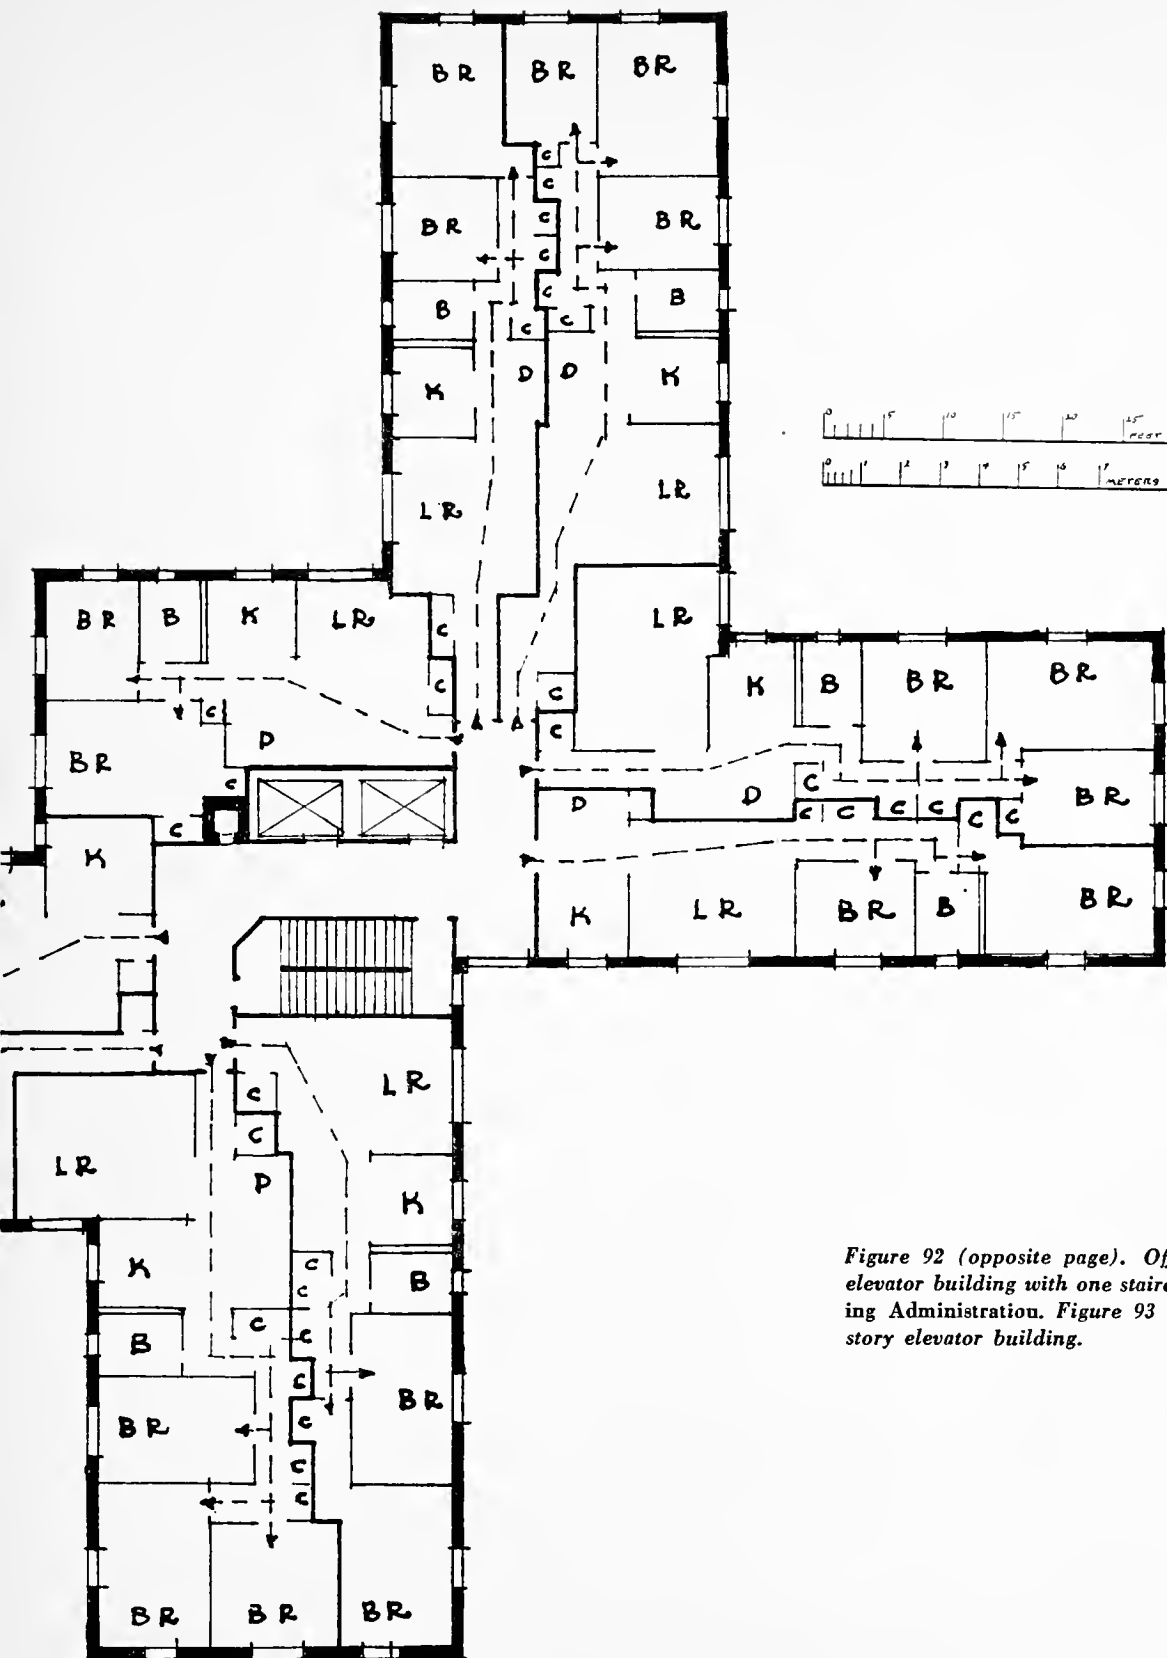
(opposite page). Offset cross six-story elevator building with one staircase. Federal Housing Administration. Figure 93 (above). Thirteen-story elevator building.
